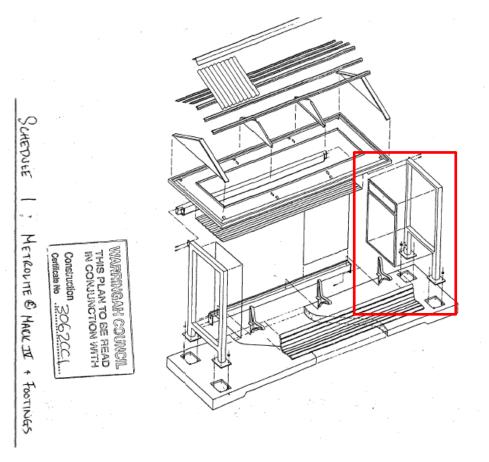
Stamped Construction Certificate Plans DA3062 (advertising panel outlined red)
